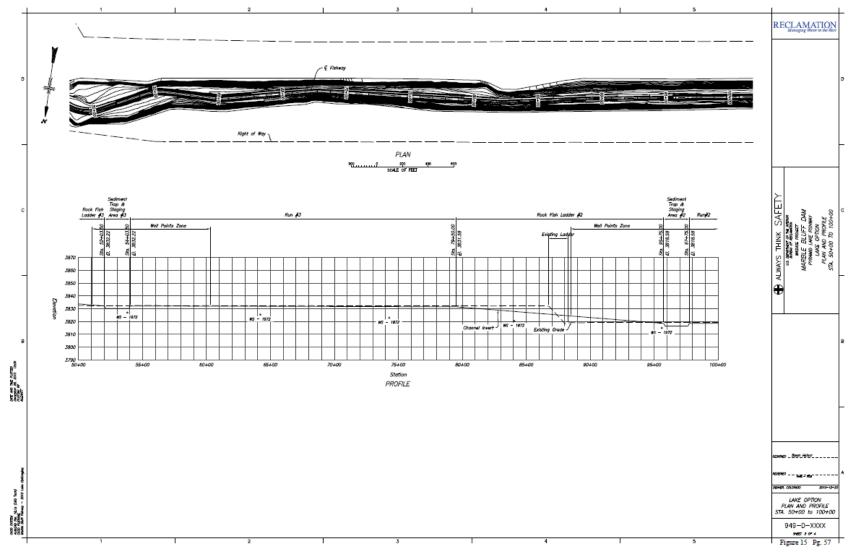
Lake fishway – plan and profile – station 50+00 to 100+00
